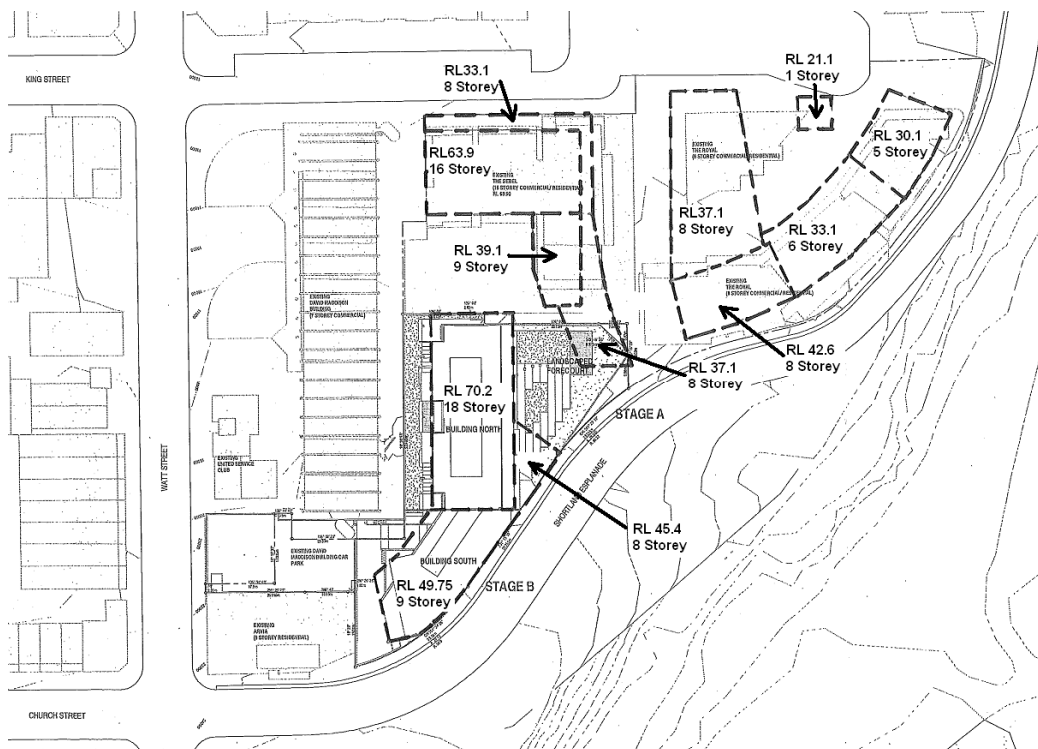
Proposed Site Plan with Concept Plan MP05_0062 building envelopes overlain.
